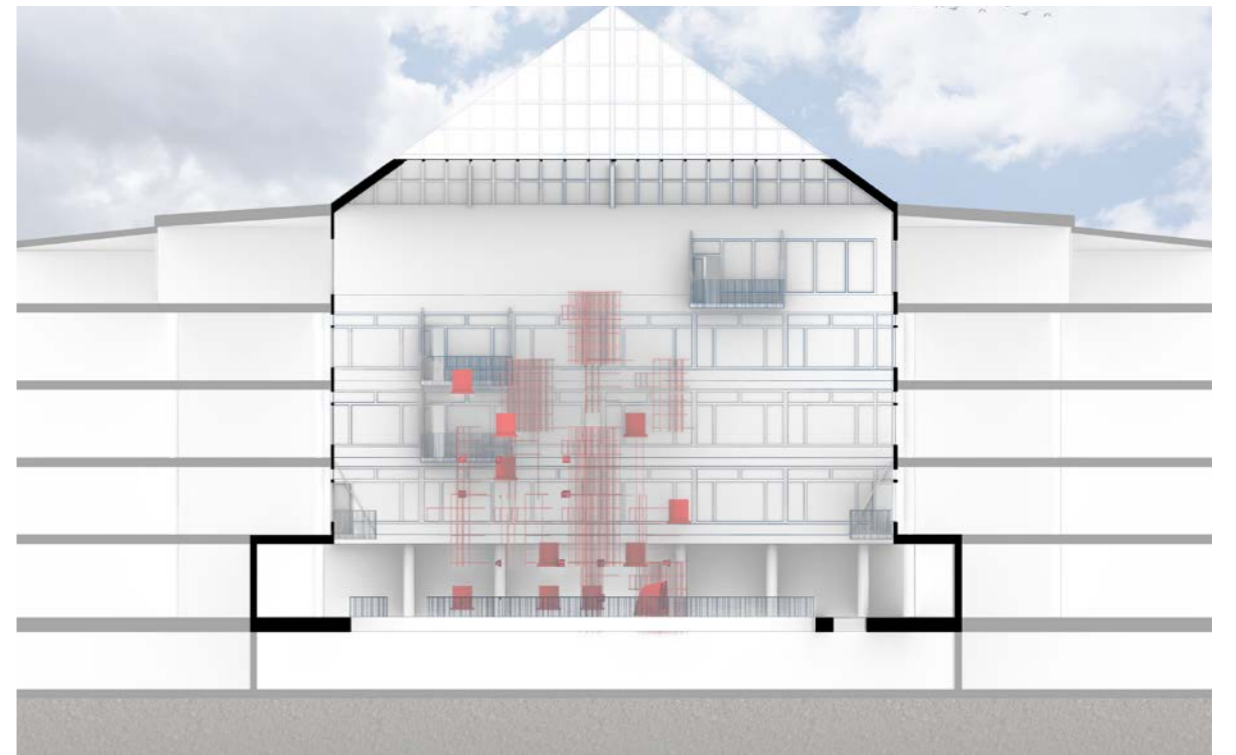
West elevation CC of Installation two and the atrium 1:350 0 4 8 12 16 20m
